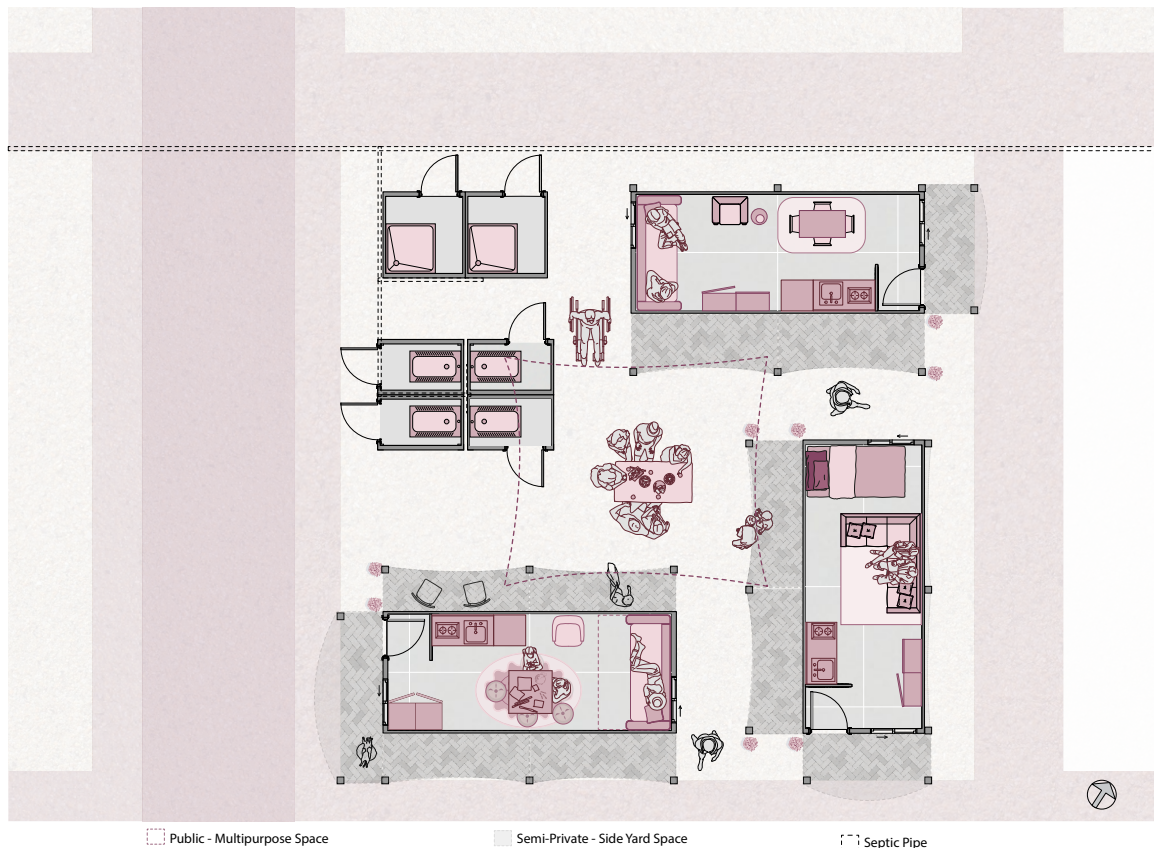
Dwelling Block floor plan, showing the use of textile and craft in inhabiting the space
